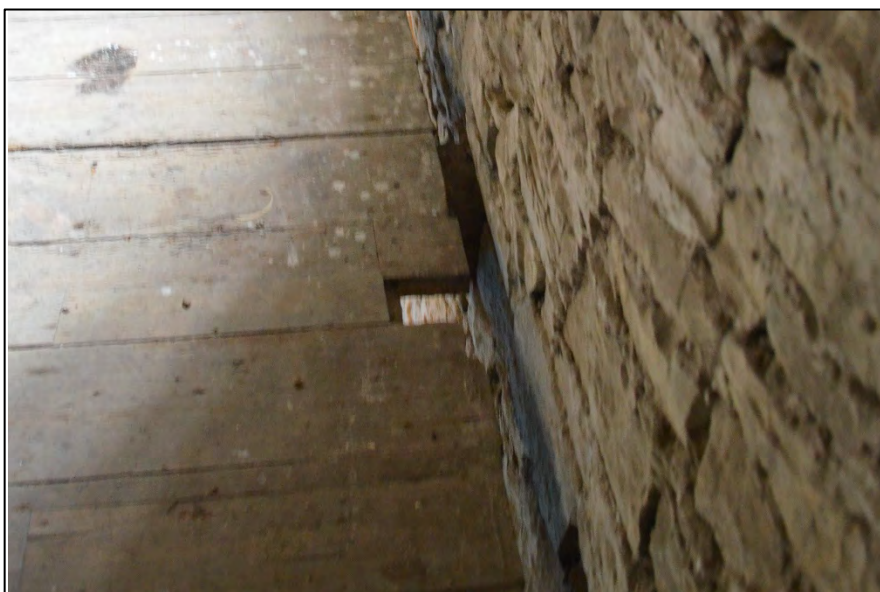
Detail of gap between the exterior wall and floor of Room F3 illustrating structural movement.
